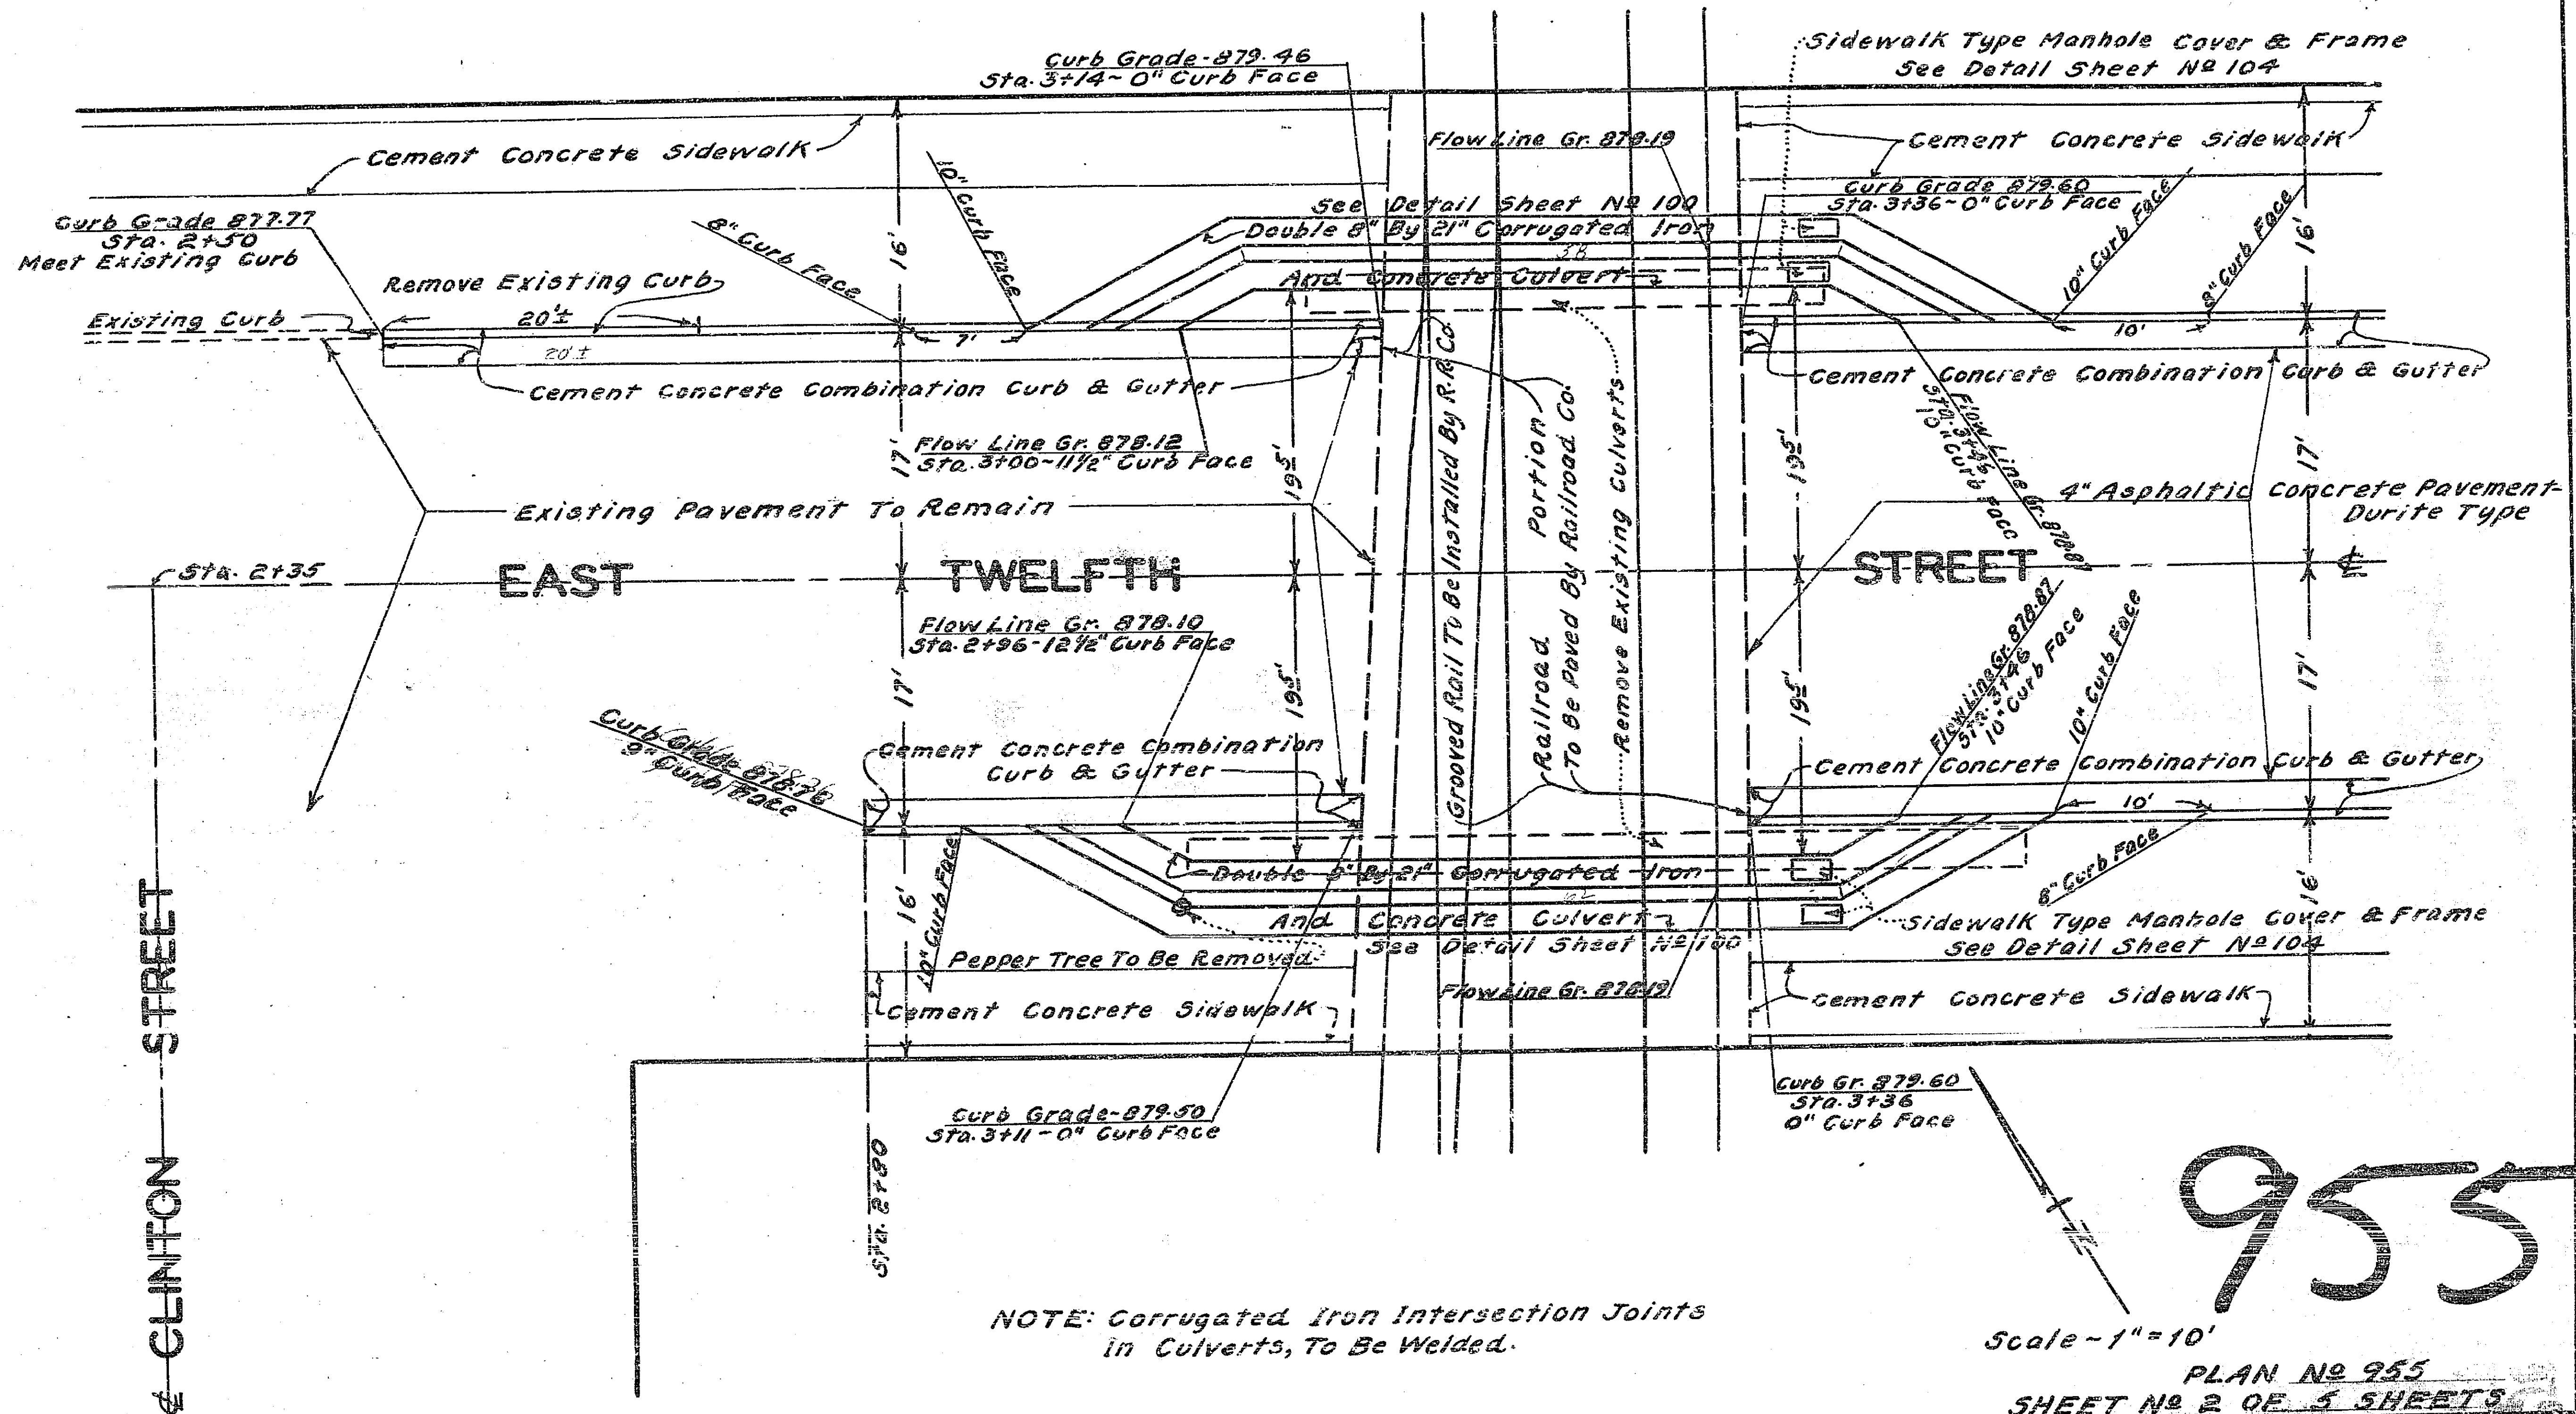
DETAILS OF CULVERTS UNDER SOUTHERN PACIFIC R.R. TRACKS
